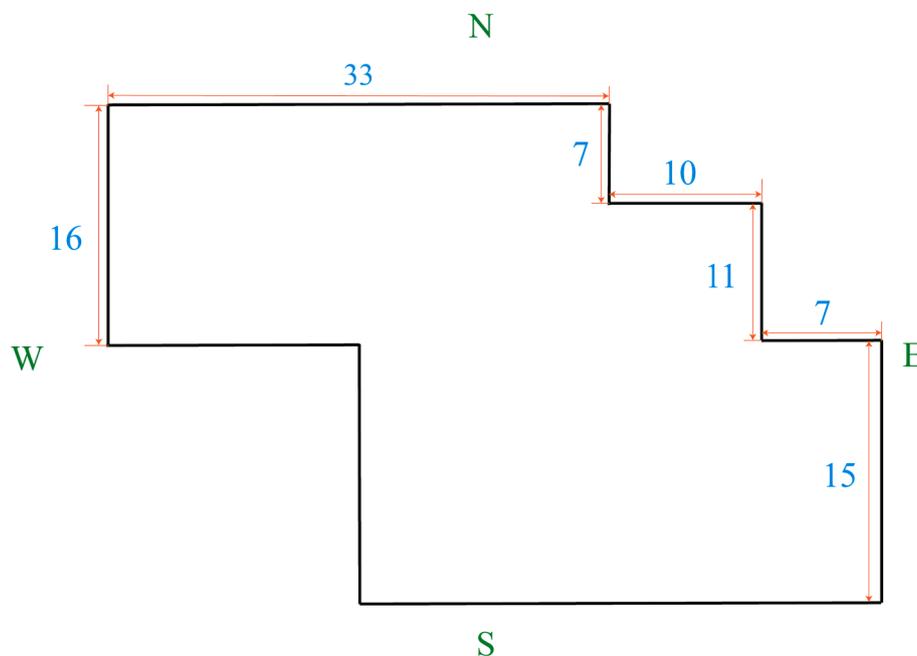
Floor plan and orientation of Costain House (the case study building).
